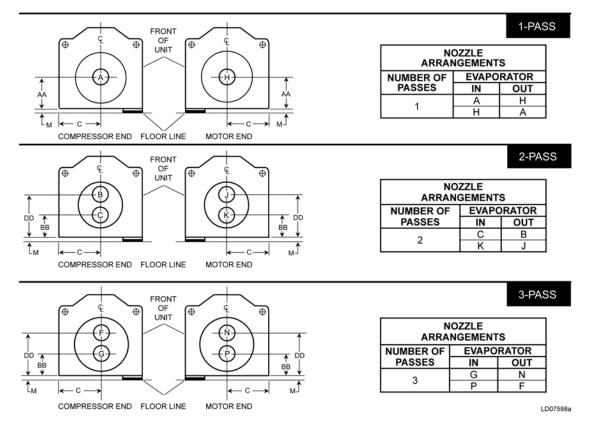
Dimensions of evaporator compact waterboxes A through L evaporators ft in. (mm)
